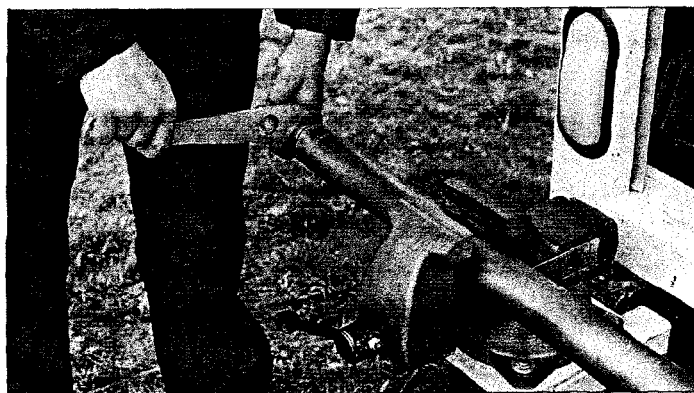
Tighten MC Drive Head with MC Combination Wrench. A vise is often used to hold the MC Sample Tube during this step.
